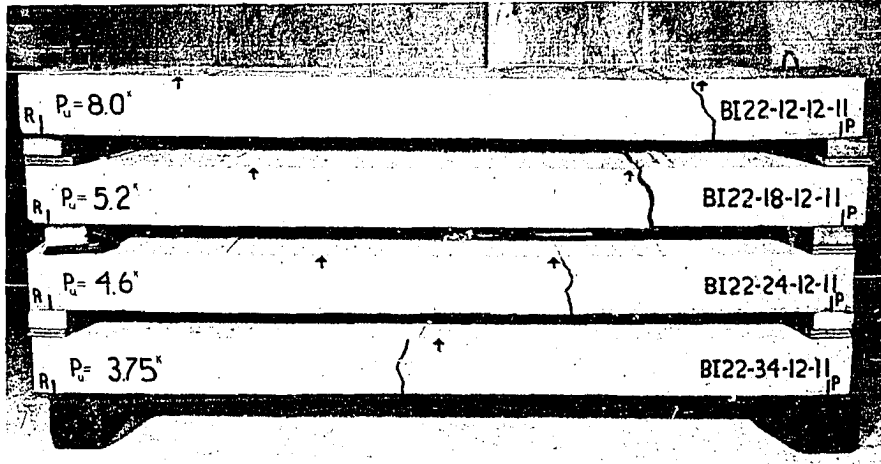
Typical shear-bond failures of beams constructed with deck I-22 gage. Each beam was 12 inches wide and 6 feet in length
